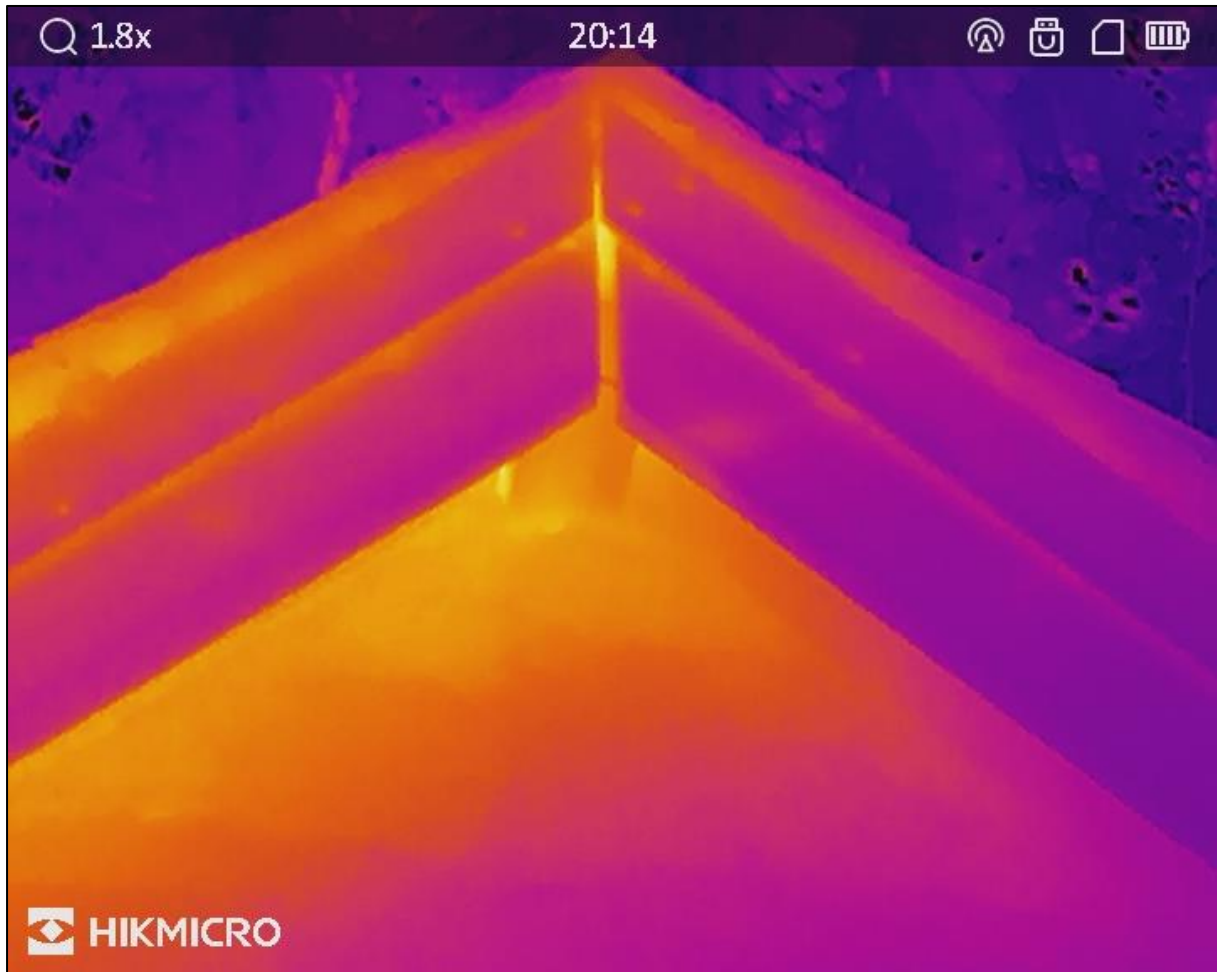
NVA viewshed of roof and wall inside the Boathouse
